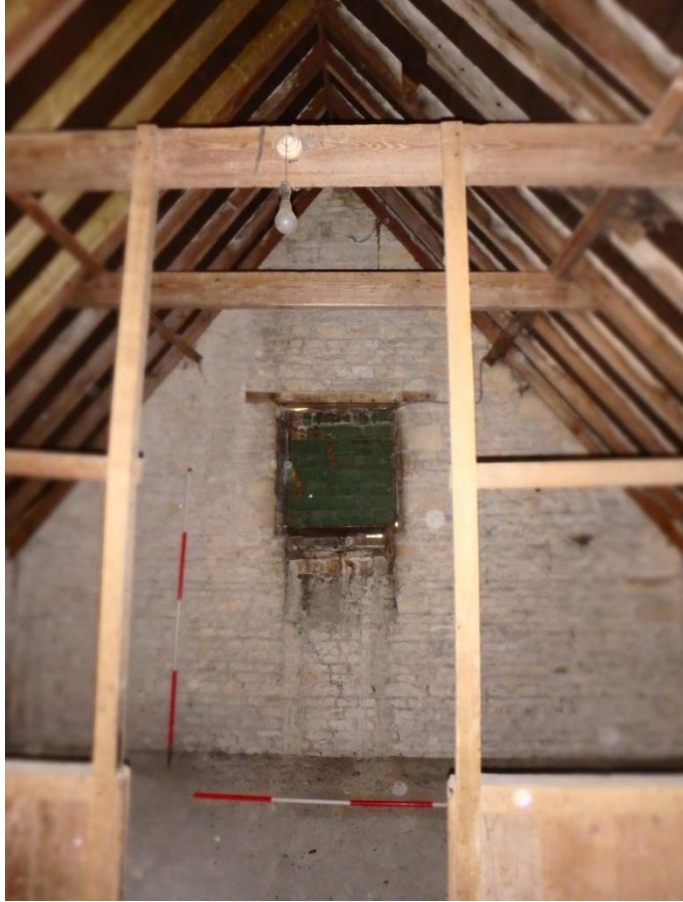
features the east wall of Room C. The fabric of this wall is composed of coursed worked and shaped limestone blocks and occasional limestone ashlar may also be discerned. However, this wall appears to have been rendered over with plasterwork or of cement, which has in turn been whitewashed over obscuring much of the underlying detail of the wall fabric.
